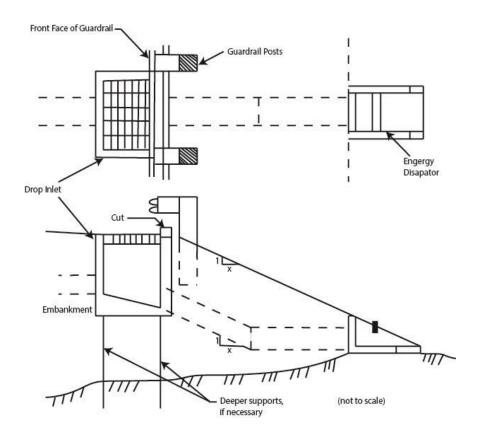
Bridge End Inlet Plan & Section Example Drawing
